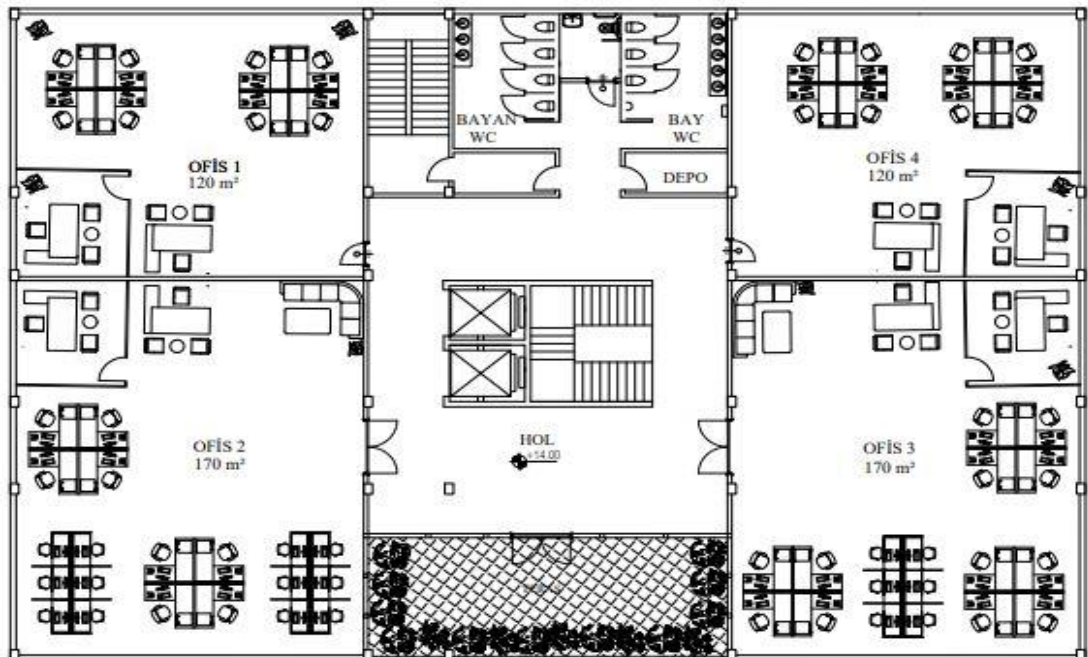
The fourth plan of the building (AutoCAD, 2019)
